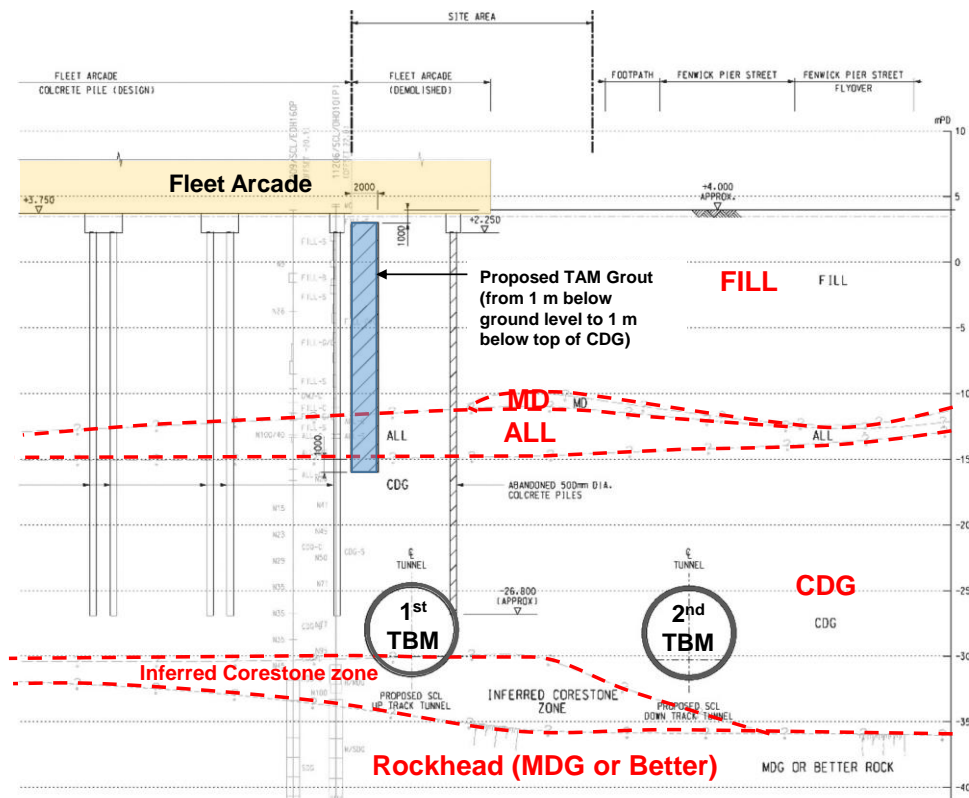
Layout plan of the Fleet Arcade and Western Bored Tunnels
